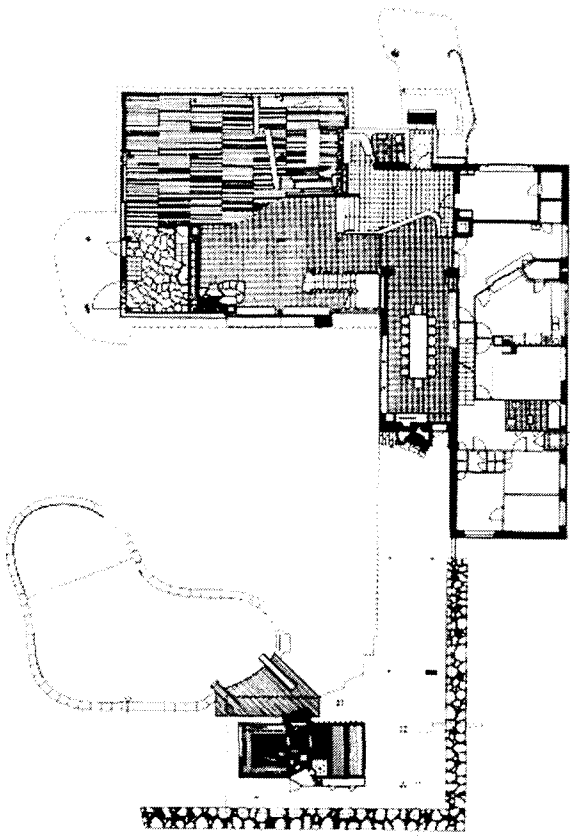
Alvar Aalto. Villa Mairea, Noormarkku, Finland (1938-41), ground floor plan.
